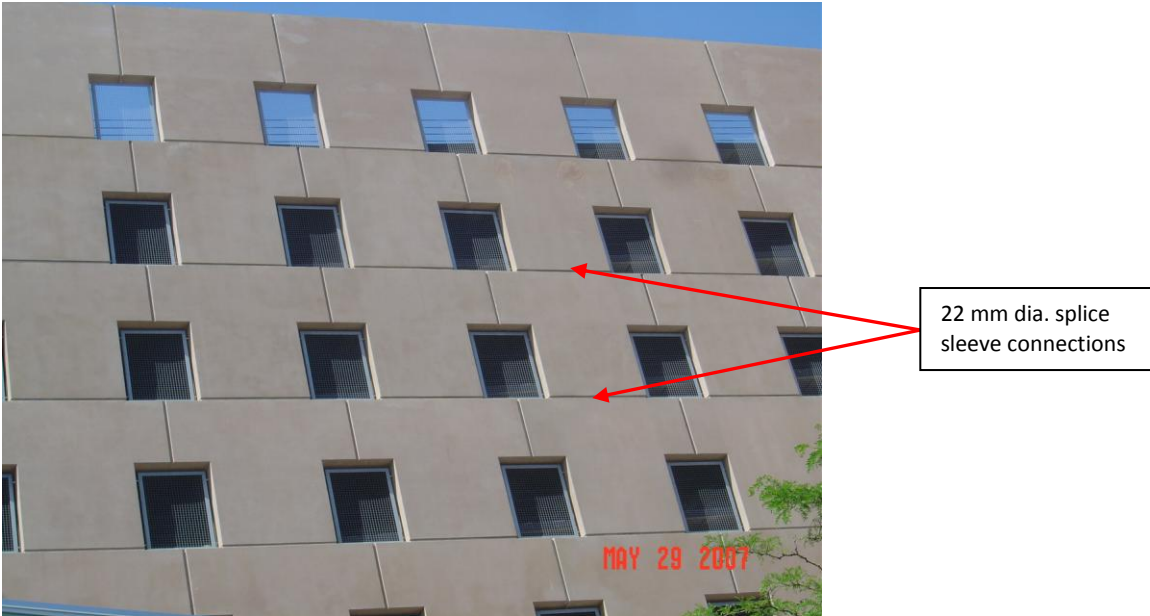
View of a typical exterior elevation showing the precast spandrel wall panels and the location of the splice sleeves connections
